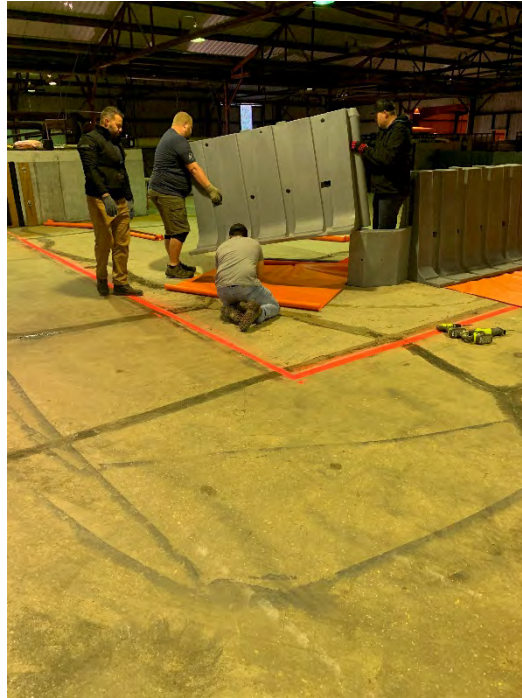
Crew joining a wall unit with the 90° corner unit. The basin right wingwall can be seen in the background to the left.
